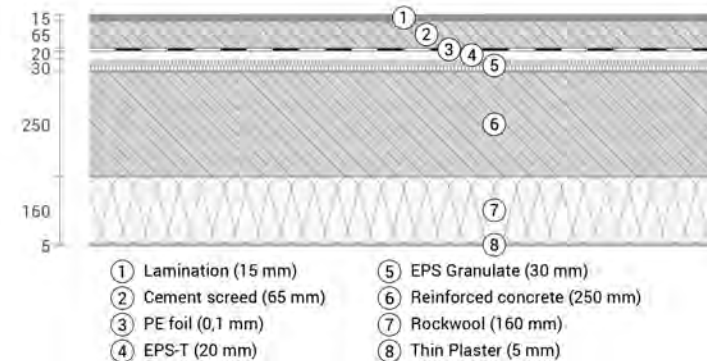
Detail of the overhang ceiling to outside air, created by the author
